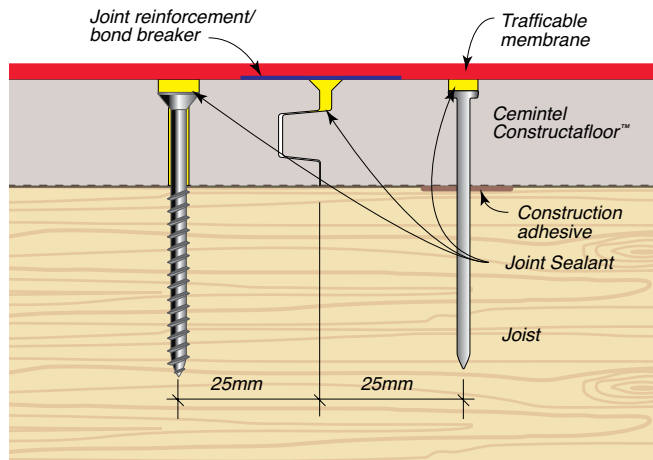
Sheet Control Joint at Butt Joint with Trafficable Membrane
